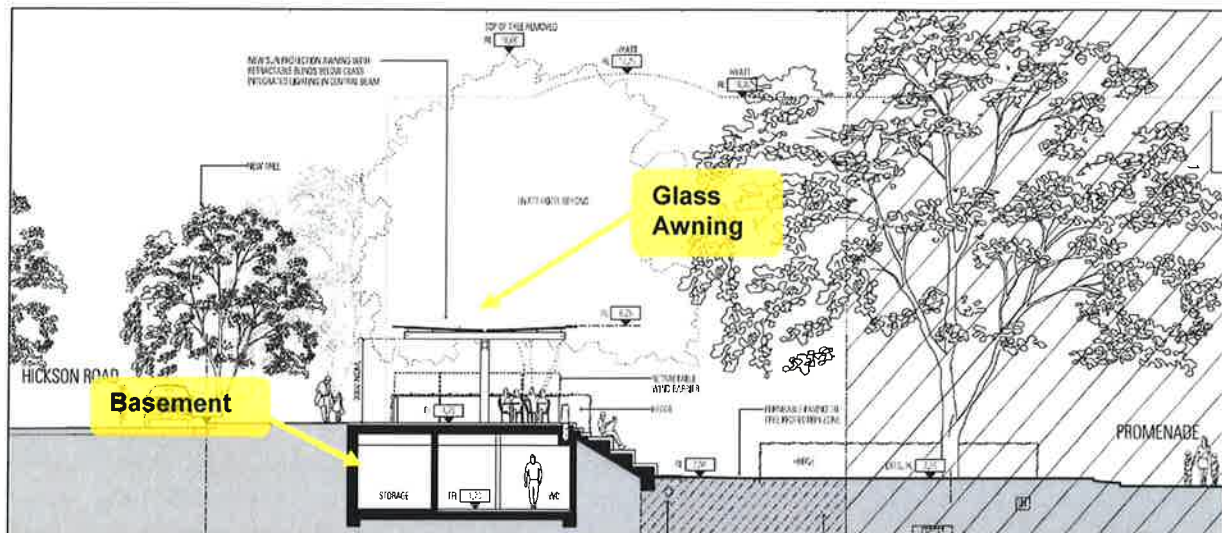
Southern section of the proposed Bay 12 landscaped terrace with glass awning and basement for services and amenities (Source: Applicant's RTS).
